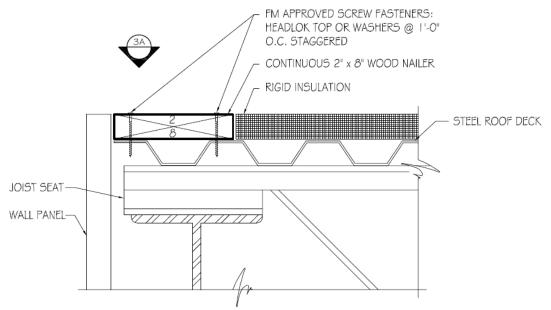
ROOF EDGE WOOD BLOCKING - SCREW FASTENER ANCHORAGE
